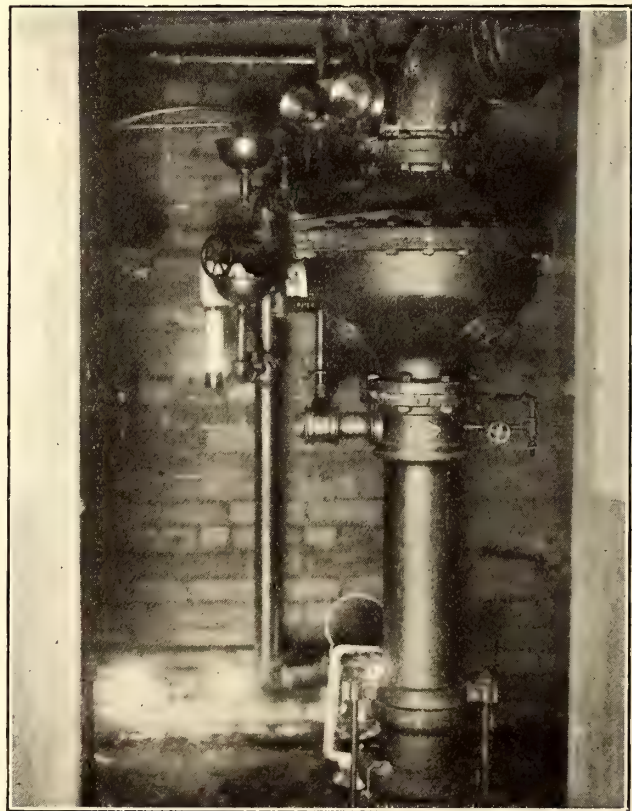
DRY PIPE VALVE IN ENCLOSURE BUILT ON OUTSIDE OF CAR HOUSE, SHOWING ELECTRIC AND OIL LAMPS FOR HEATING
